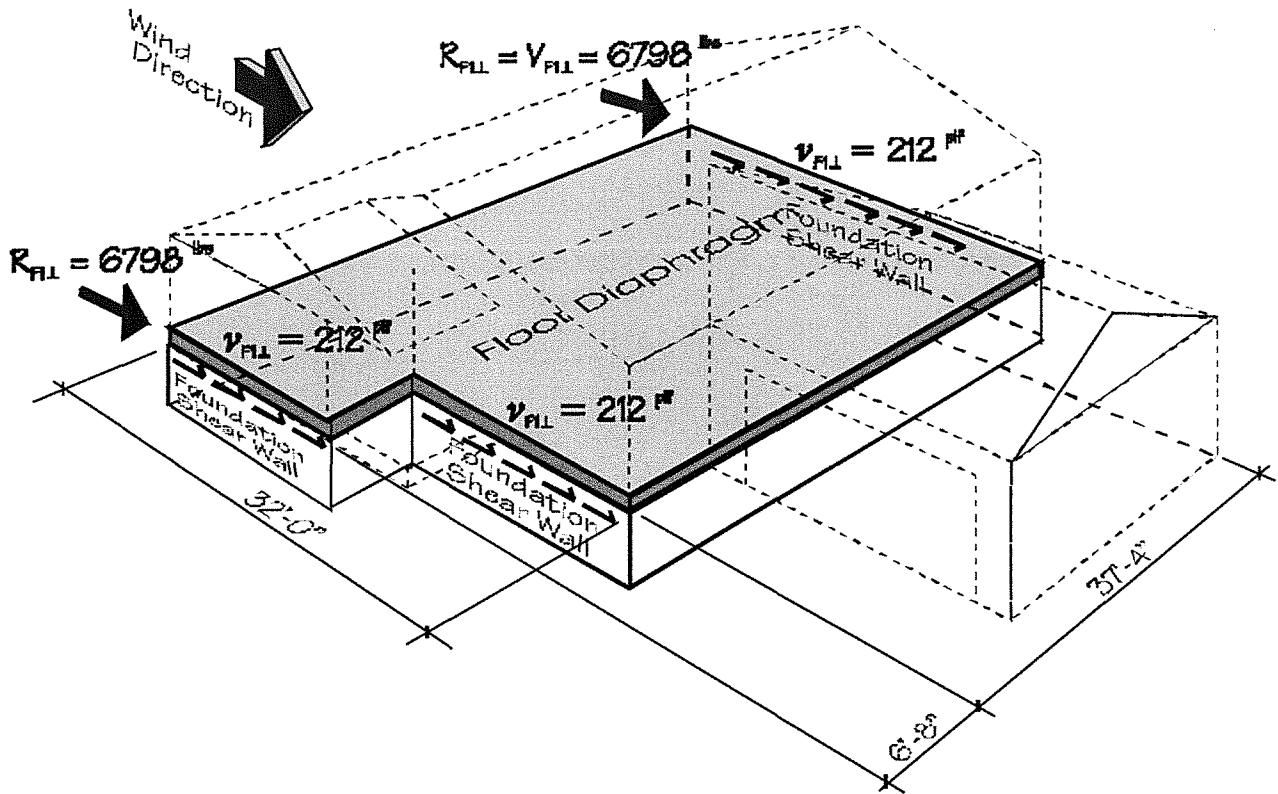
Perspective of One Story Residence Floor Diaphragm Reaction and Shear
